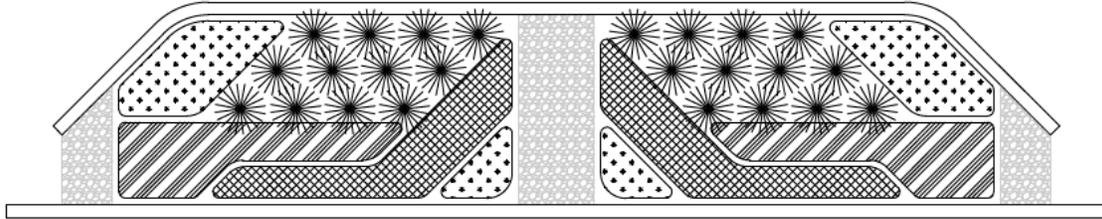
CURB EXTENSION PLANTING TEMPLATE OPTION 1
